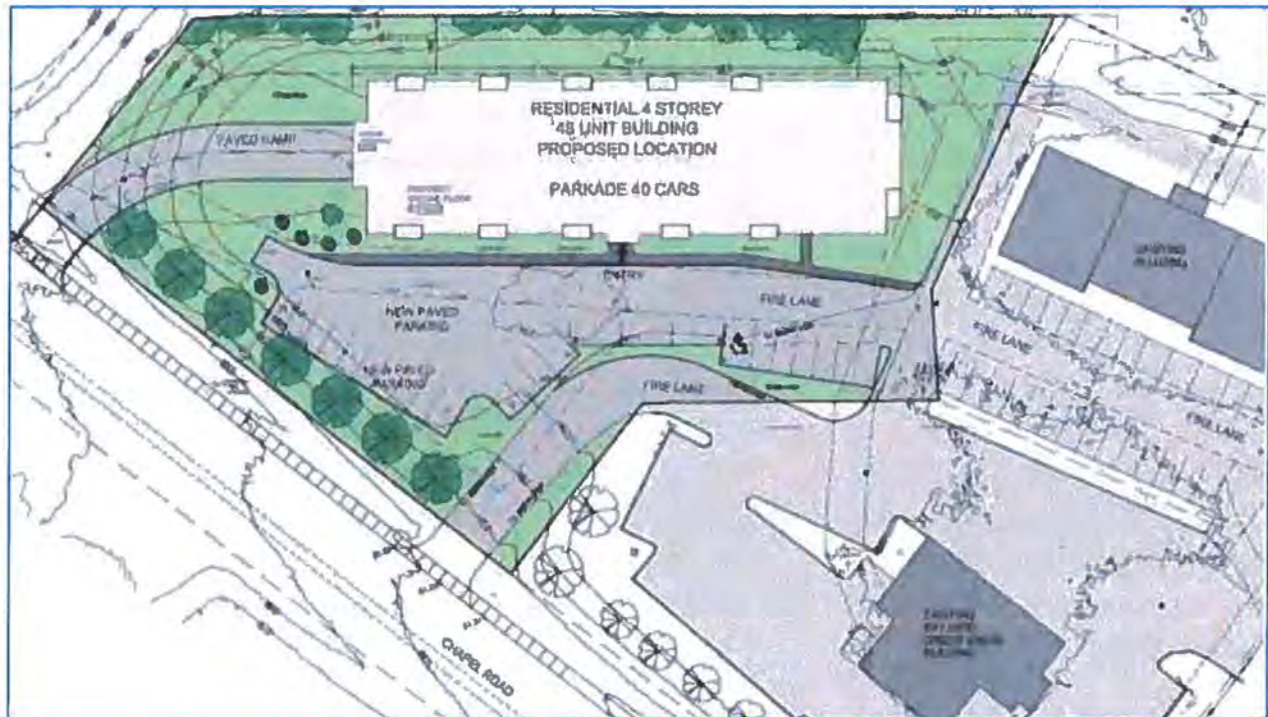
Proposed Site Plan - Vacant Lot off Chapel Road
